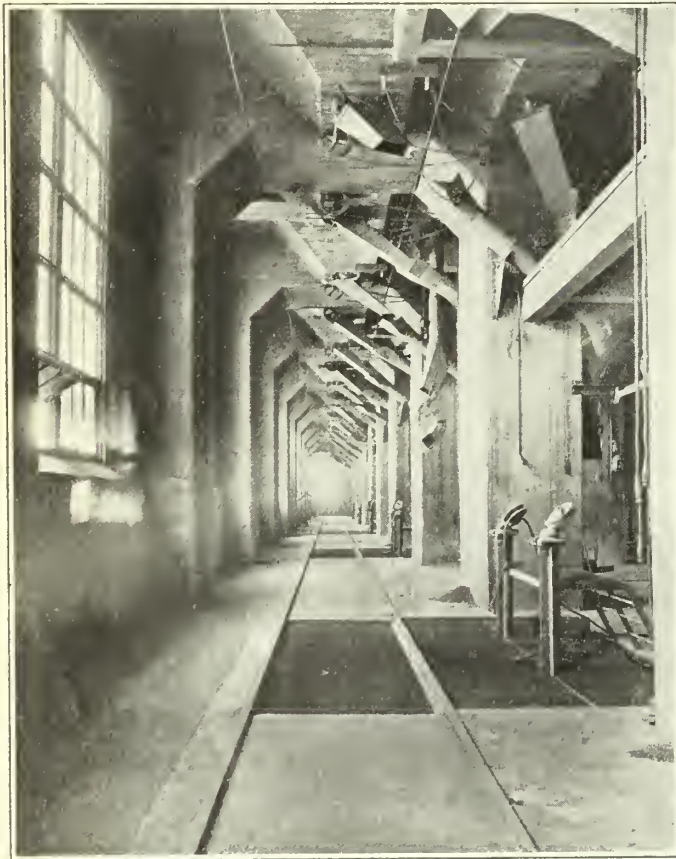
Harbour Commissioners of Montreal Elevator No. 2, showing railroad tracks running through house.
